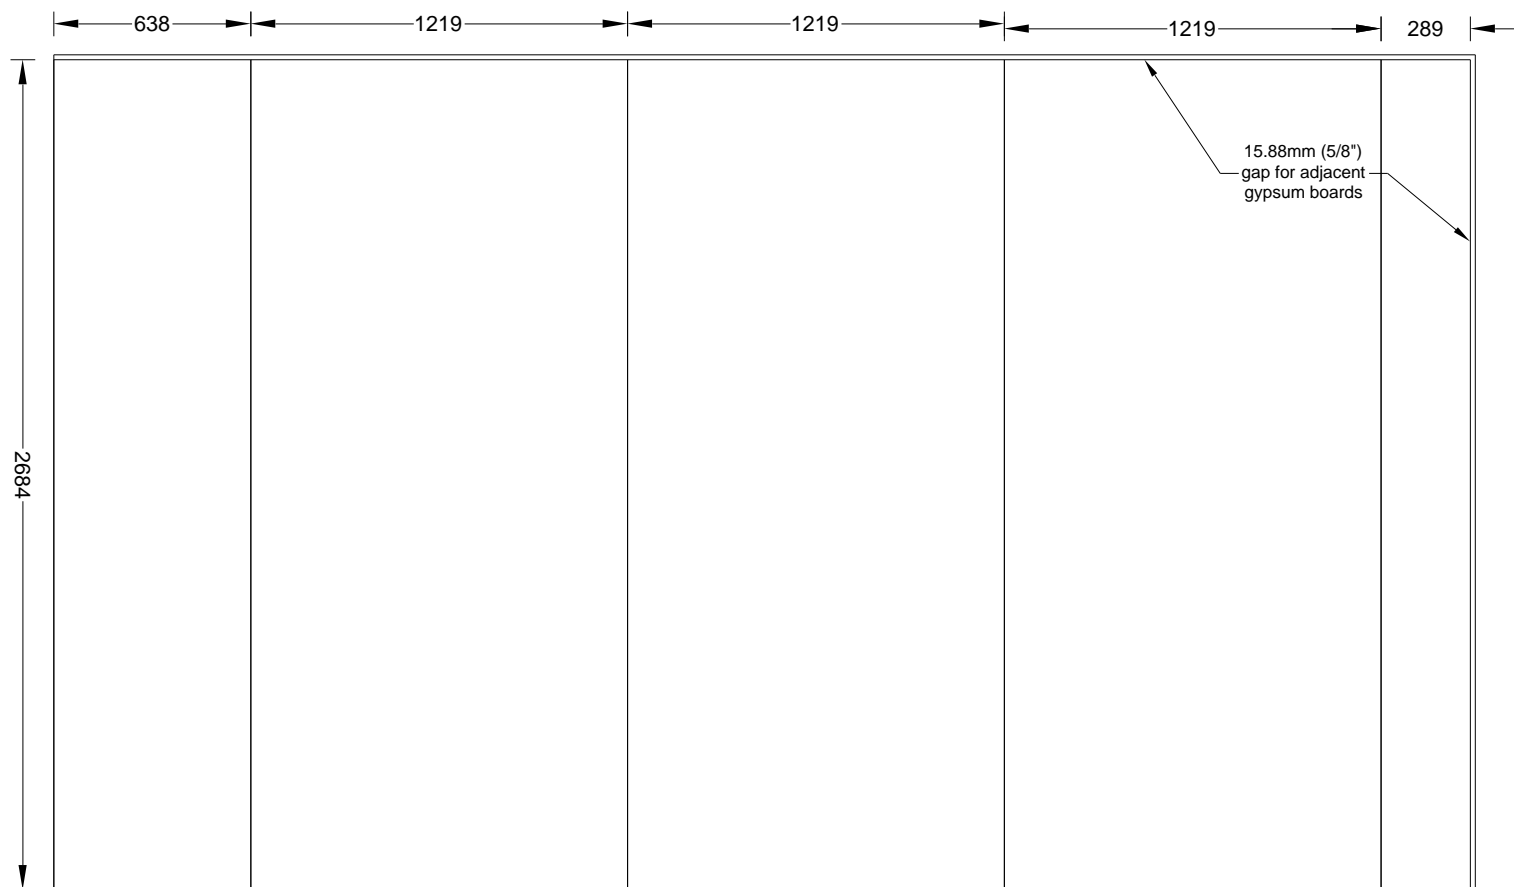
Test 1-2 Large Compartment CLT - W3 - Gypsum Layout - Base Layer
